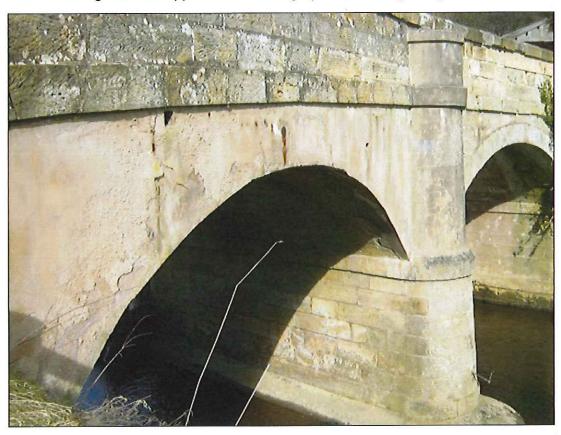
West upstream elevation northern span with rendered mass concrete arch widening and spandrel walls.
